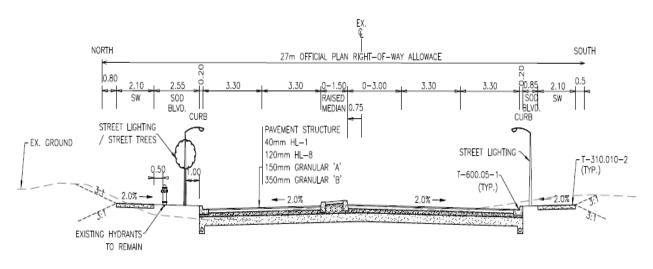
Alternative Design 4C: Typical Cross Section at Markham Road
